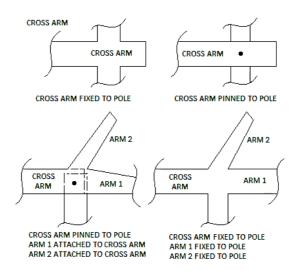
Connection of cross arms and davit arms. Fig. 4.6-3 of (Power Line Systems Inc₅, (2016)
